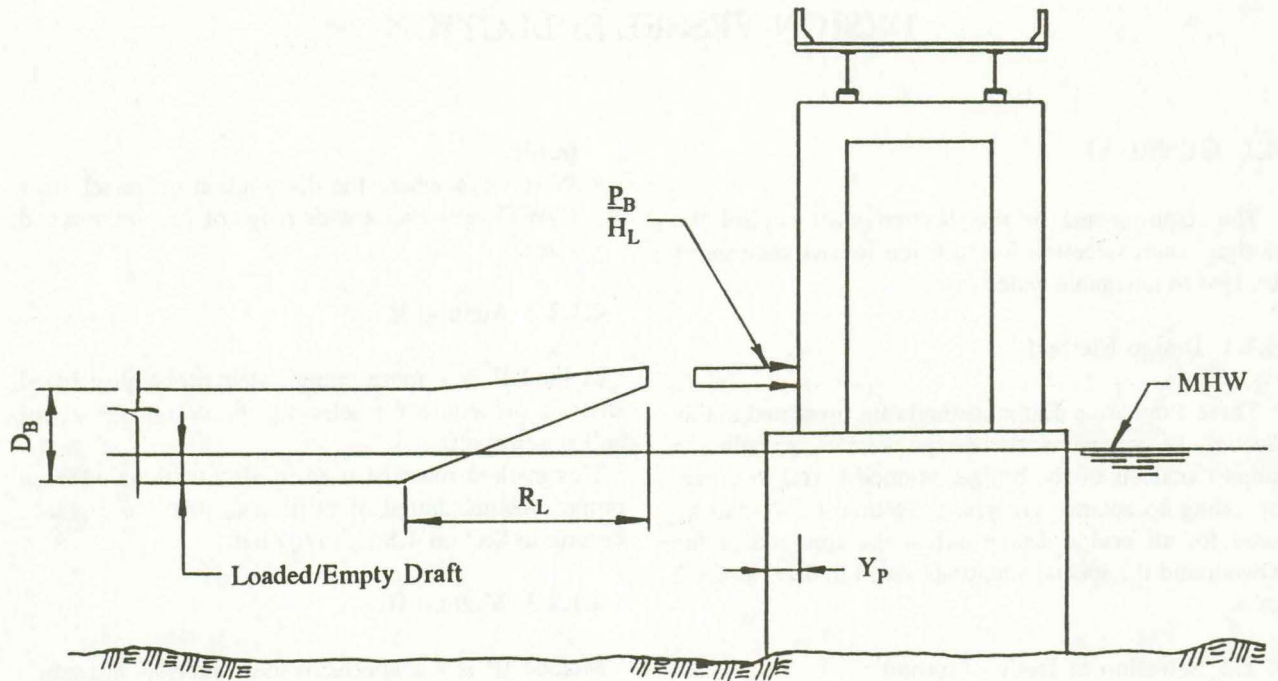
Barge Impact Line Load for Local Collision Force on Pier (For Structure Check & Design).
